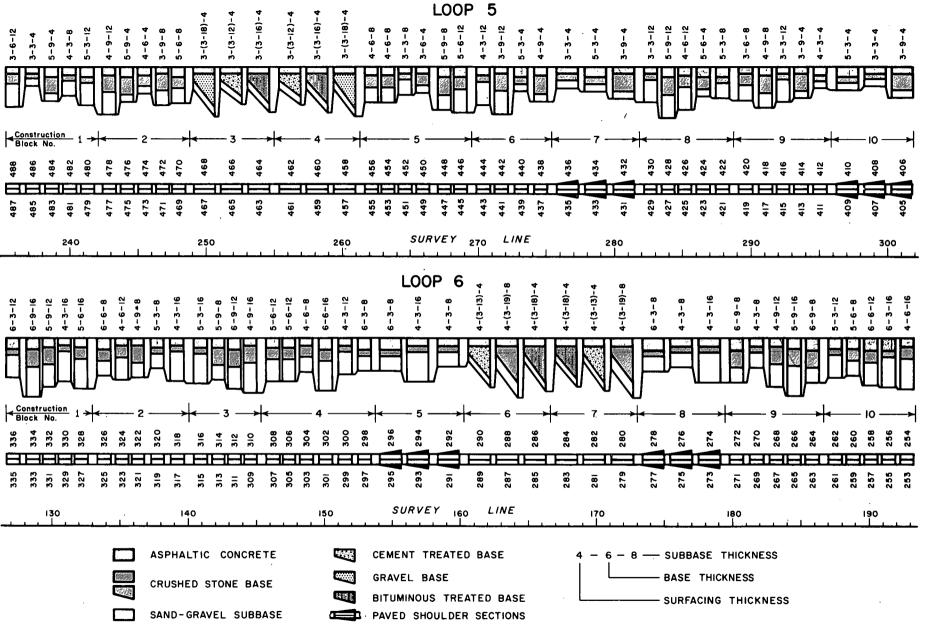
Layout of flexible tangent, Loops 5 and 6.
